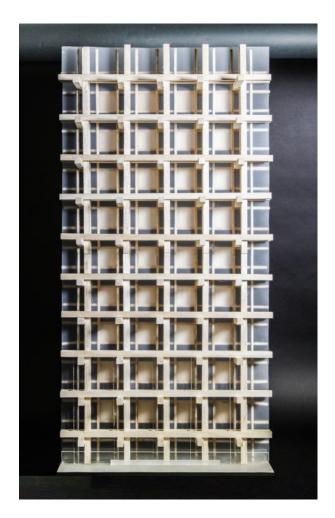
1:10 Facade detail model - elegance through simplicity and repetition (Made from Balsa wood with PVC sheeting)
